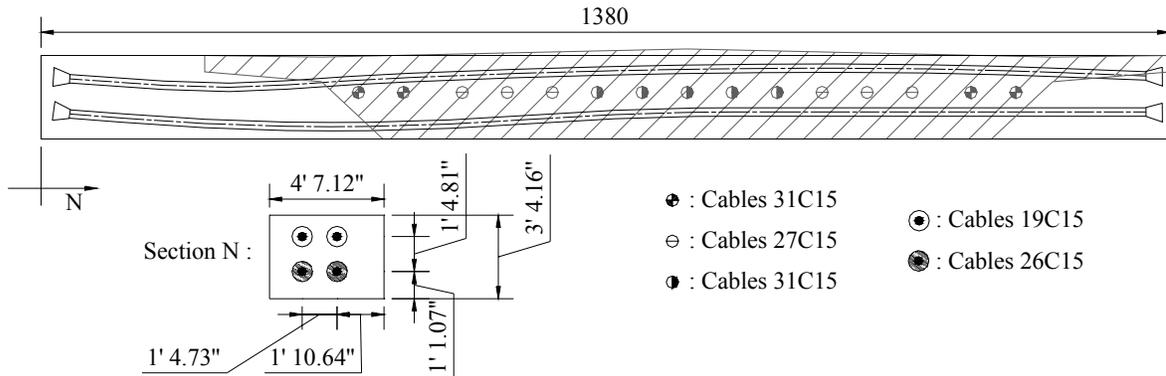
Crossbeam for asymmetrical pier placement (pier type B)
